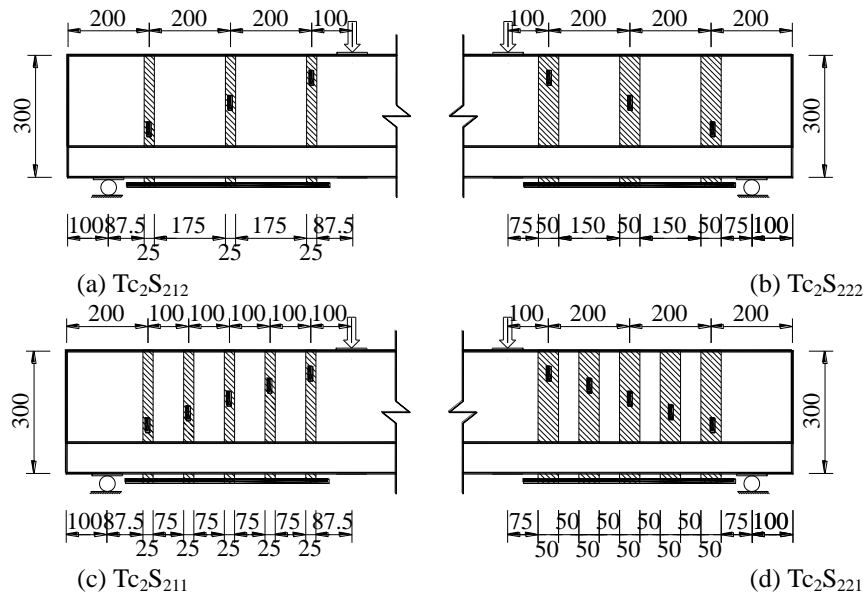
CFRP detailing and strain-gauge locations (all dimensions in mm)
